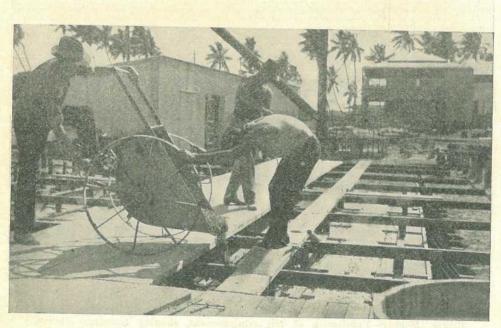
TOWNSVILLE CITY.—Hynes Road to Castle Hill.
